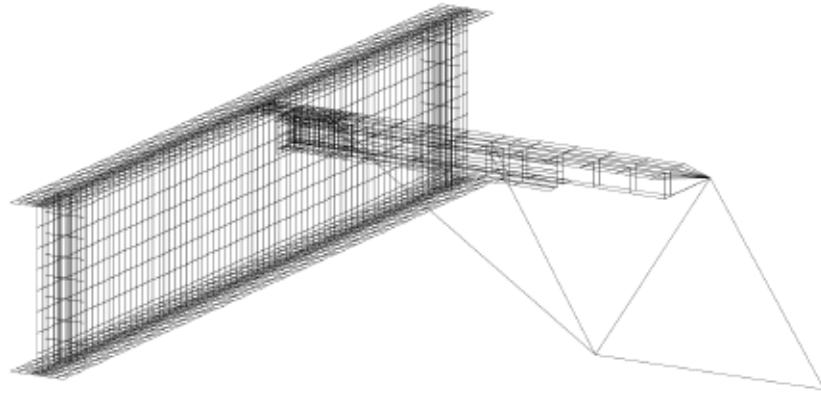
Single-Sided Finite Element Model (WF Girder)
